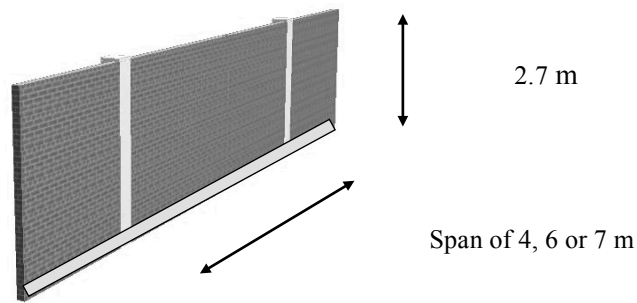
Wall of conventional reticulated reinforced concrete building filled with ceramic blocks as functional unit
